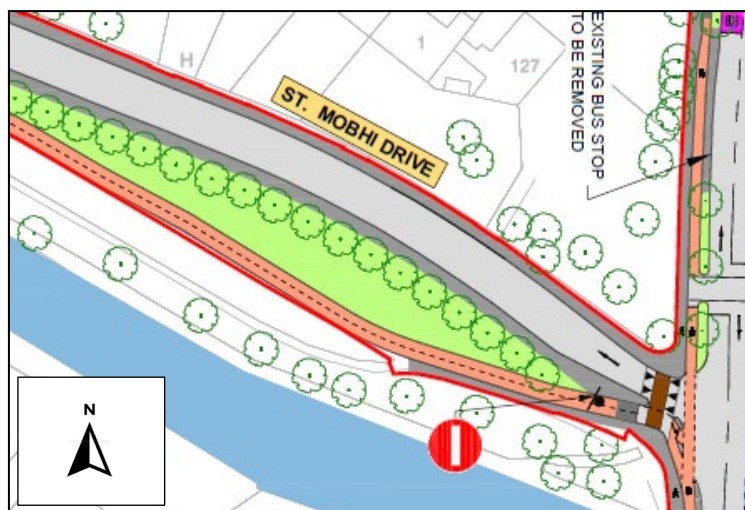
Extract from General Arrangement Drawing Sheet 10 at St. Mobhi Drive
